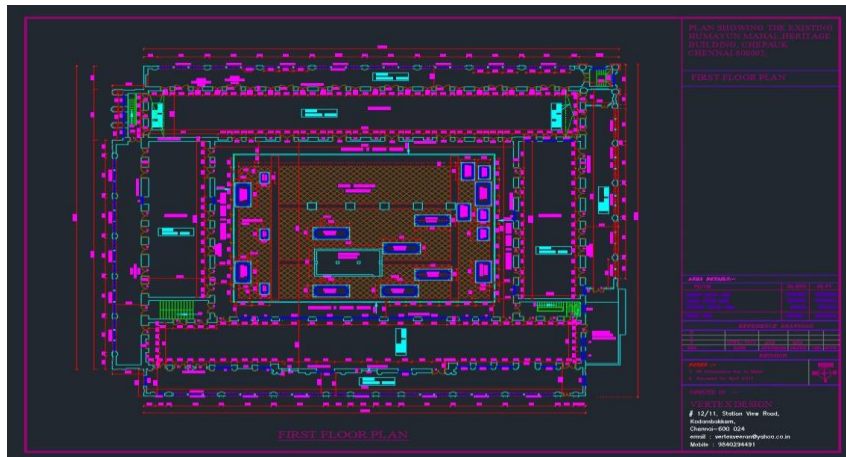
c. Shows the Plan layout of the Humayun Palace in the format of a CAD drawing.
